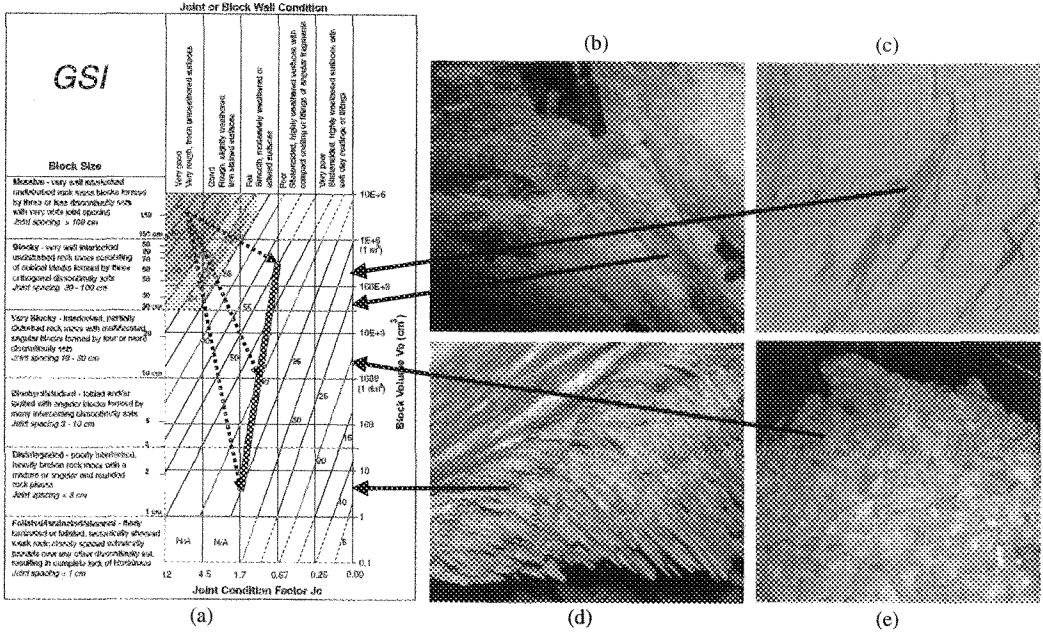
(a) GSI-chart showing degradation paths for ultimate block sizes of 1.5, 10 and 70cm edge lengths; (b) spalling in back of Piora tunnel, Switzerland (image ~2m wide); (c) Lötshberg tunnel wall (slab ~ 30cm thick); (d) Spalling in notch at URL, AECL, Canada (image ~1m wide); (e) fragmented fall of ground due to rockburst (image ~2.5m wide).
